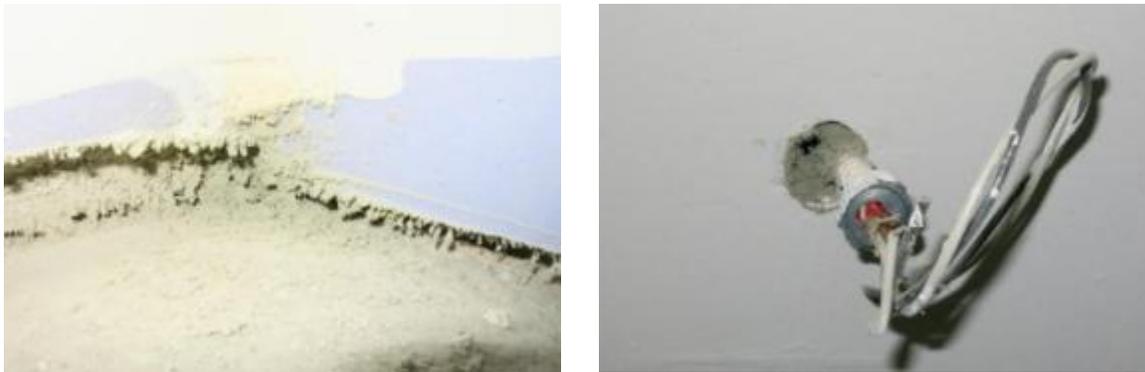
Effective seal at drywall joint (L); sealed leak susceptible to damage from construction (R)
